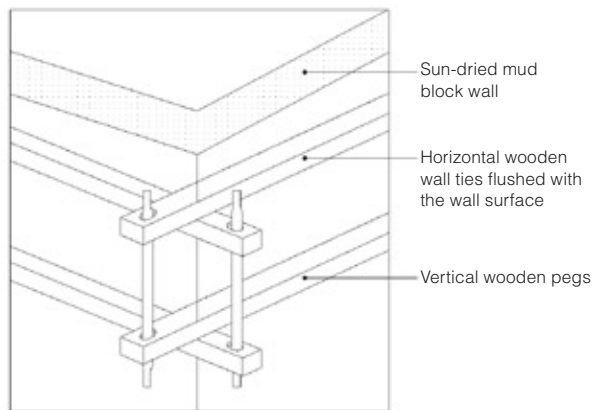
Seismic retrofit with horizontal and vertical wall ties, which are fixed like a protective framework, along the external facade of the earthen structures.
